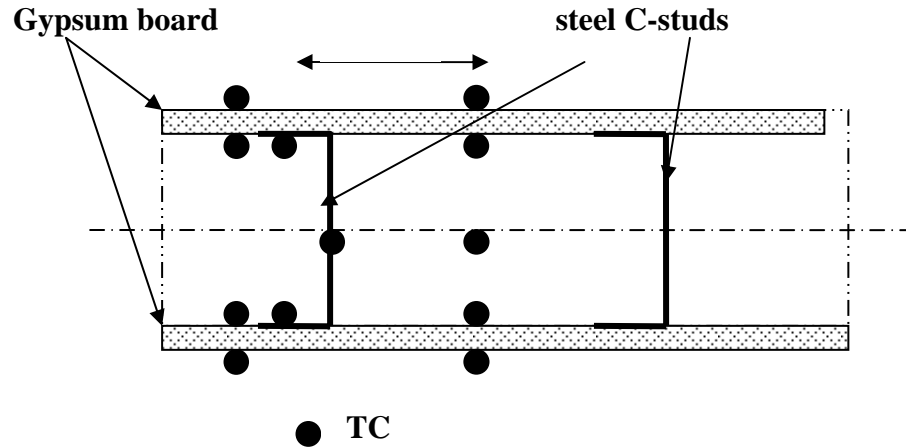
Cross-section for thermocouple (TC) layout – Wall No. 1.
